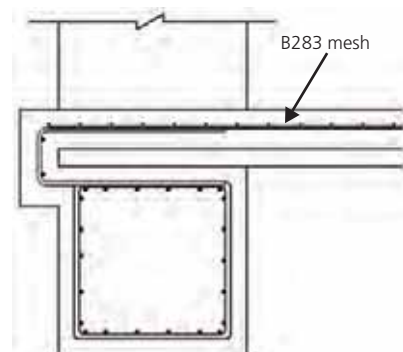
Collar beam reinforcement lapping with reinforcement for invert protection paving
